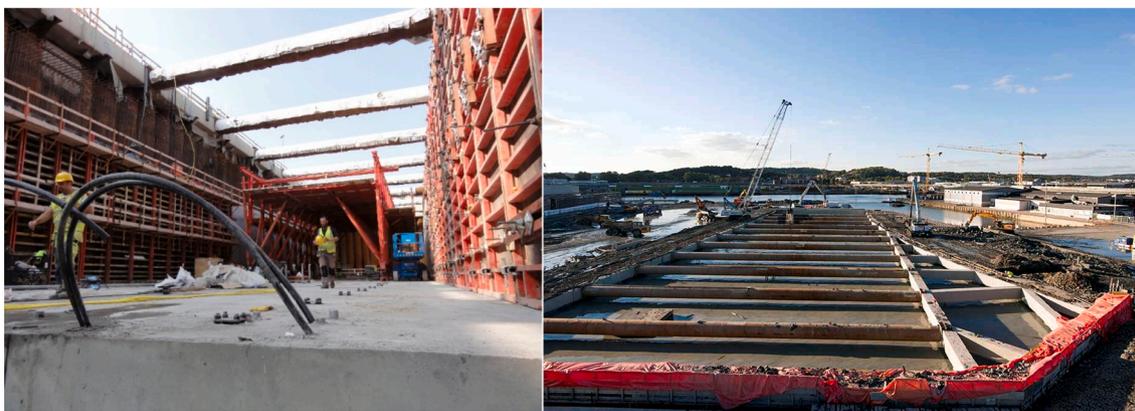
Pictures of the construction pit (source: Trafikverket).
